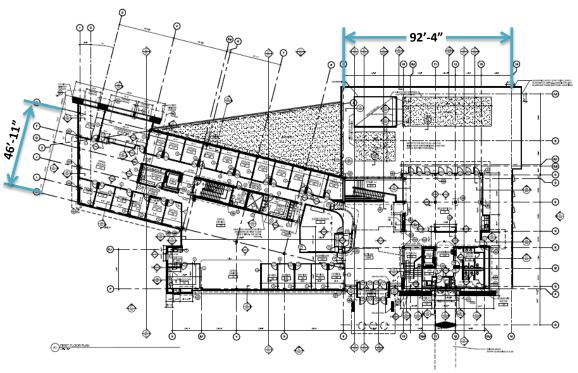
Typical Floor Plan (Level 1) Drawing A101
